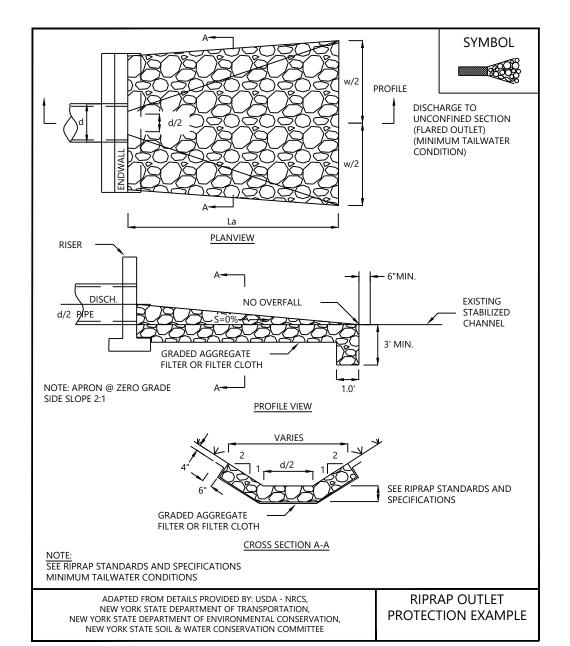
RIPRAP OUTLET PROTECTION DETAIL (1)
